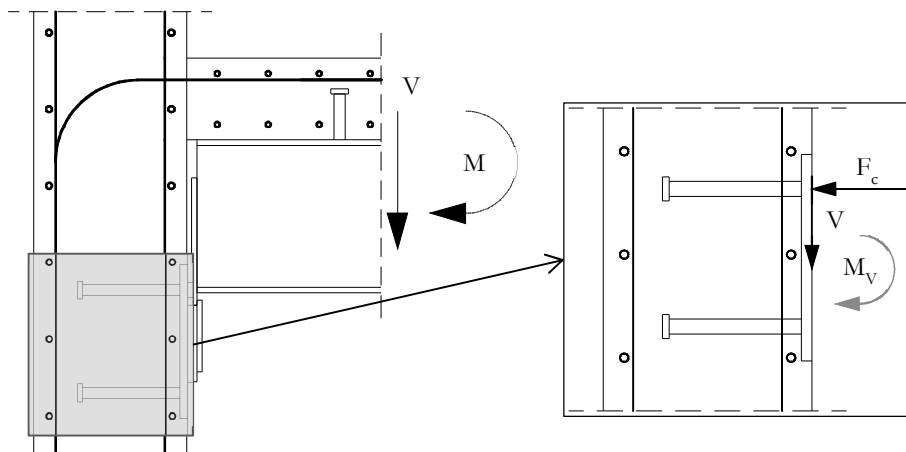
Loading conditions of the anchor plate on the semi-continuous joint under hogging bending moment and shear loading
